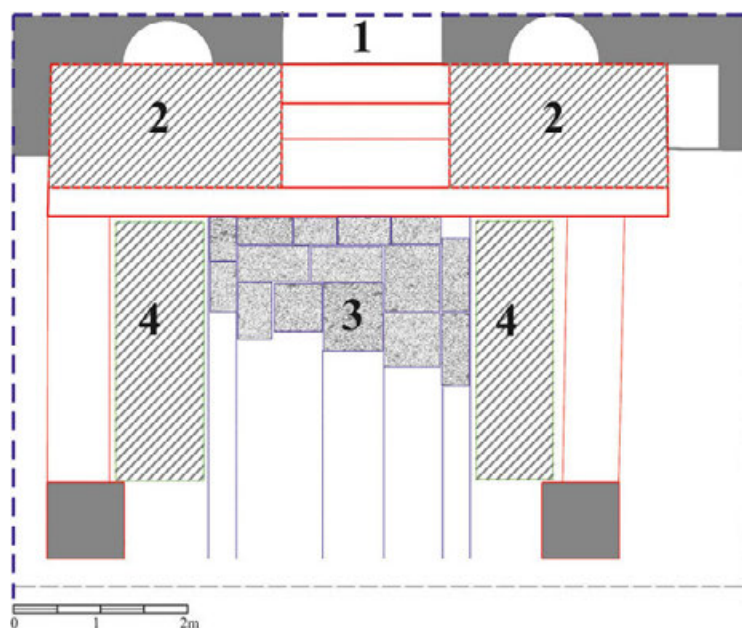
Sector 2, squares B1, C1, D1, reconstruction of the access road
